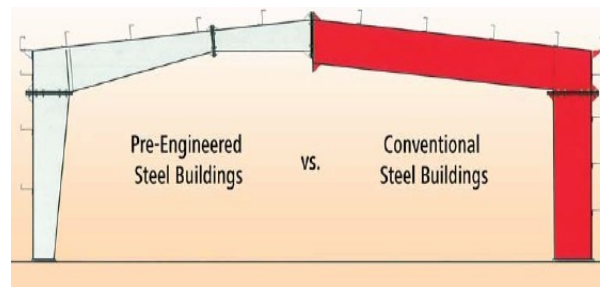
Pre-Engineering Building vs. Conventional Steel Building
